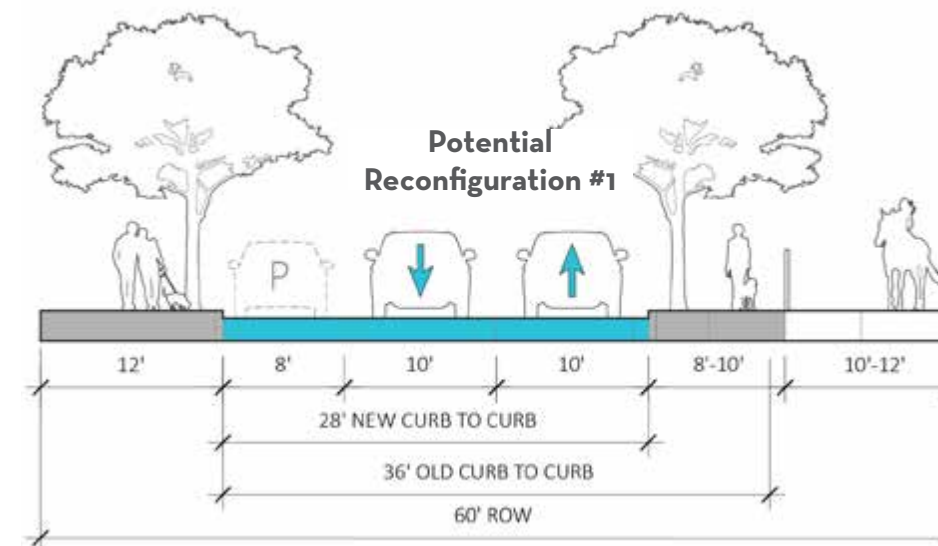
Potential Reconfiguration: Bridle Path with On-Street Parking Removed on One Side of the Street.
